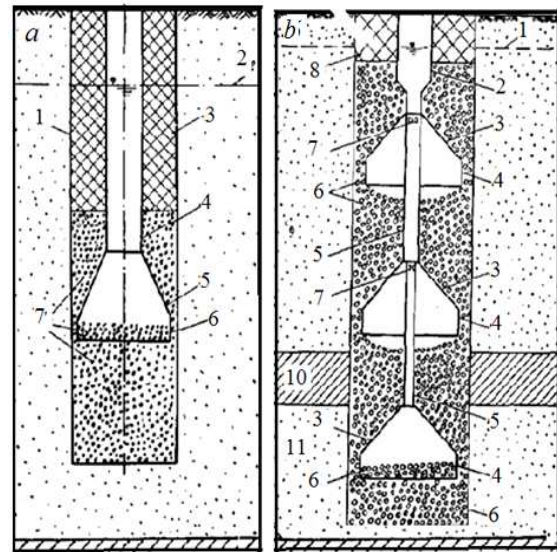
Bell type Water Well Construction (BWW): *a* – Single Tier Construction, *b* – Multi Tier Construction
